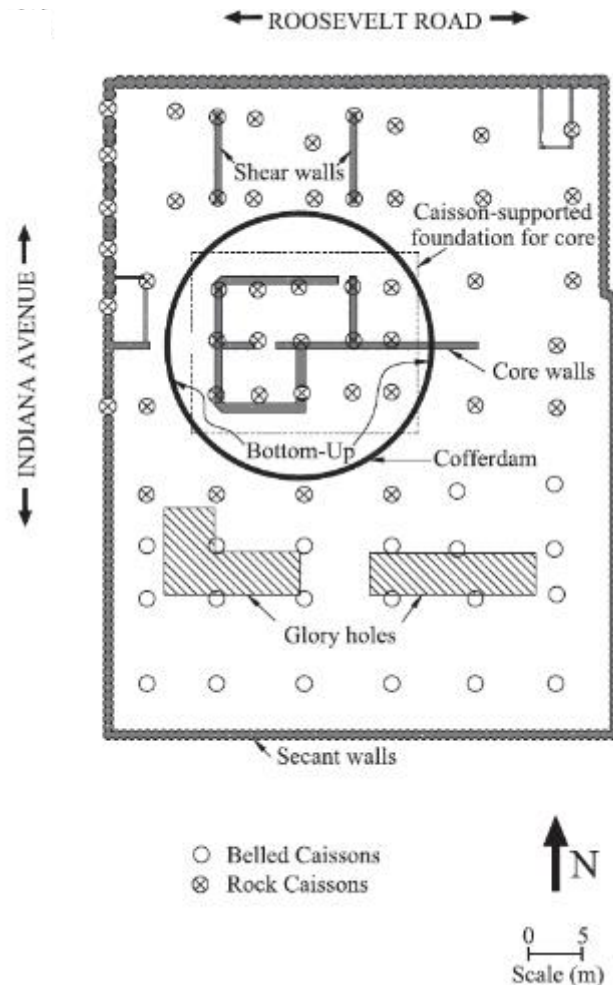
Schematic plan view of OMPW contentions and foundation systems. After (Arboleda-Monsalve 2014).
